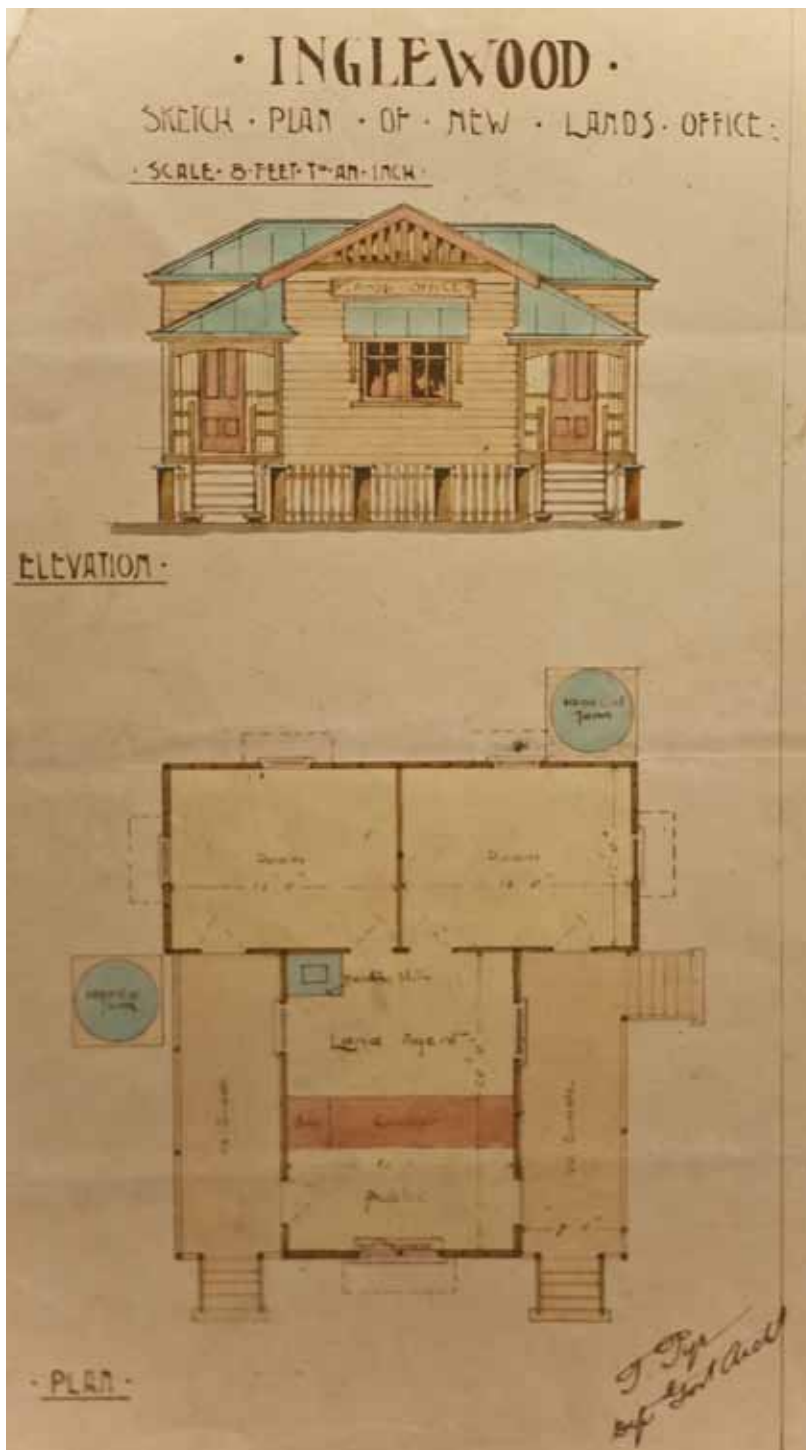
Plan and front elevation of Lands Department office, Inglewood, 1907 (QSA 602996)
